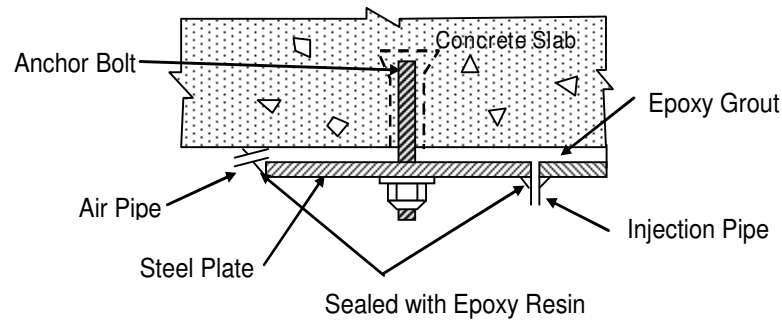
Detail of Injection Method Sealing with Epoxy Adhesive
